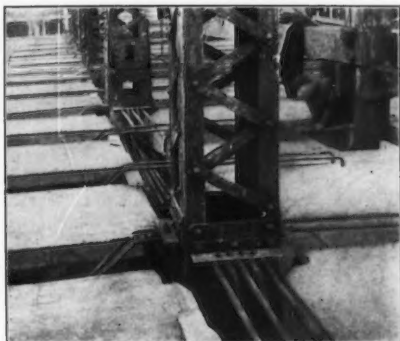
METHOD OF SECURING REINFORCEMENT.
